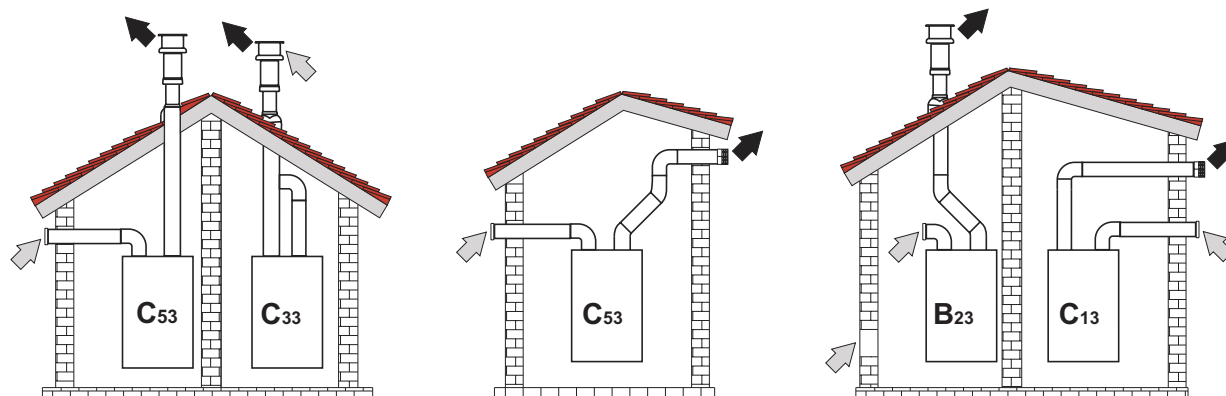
Examples of connection with separate pipes (⇨ = Air / ⇨ = Fumes)
